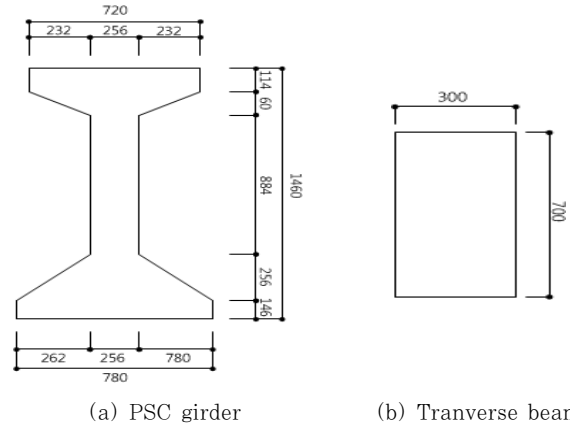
Section dimension of PSC girder and transverse beam(mm)
